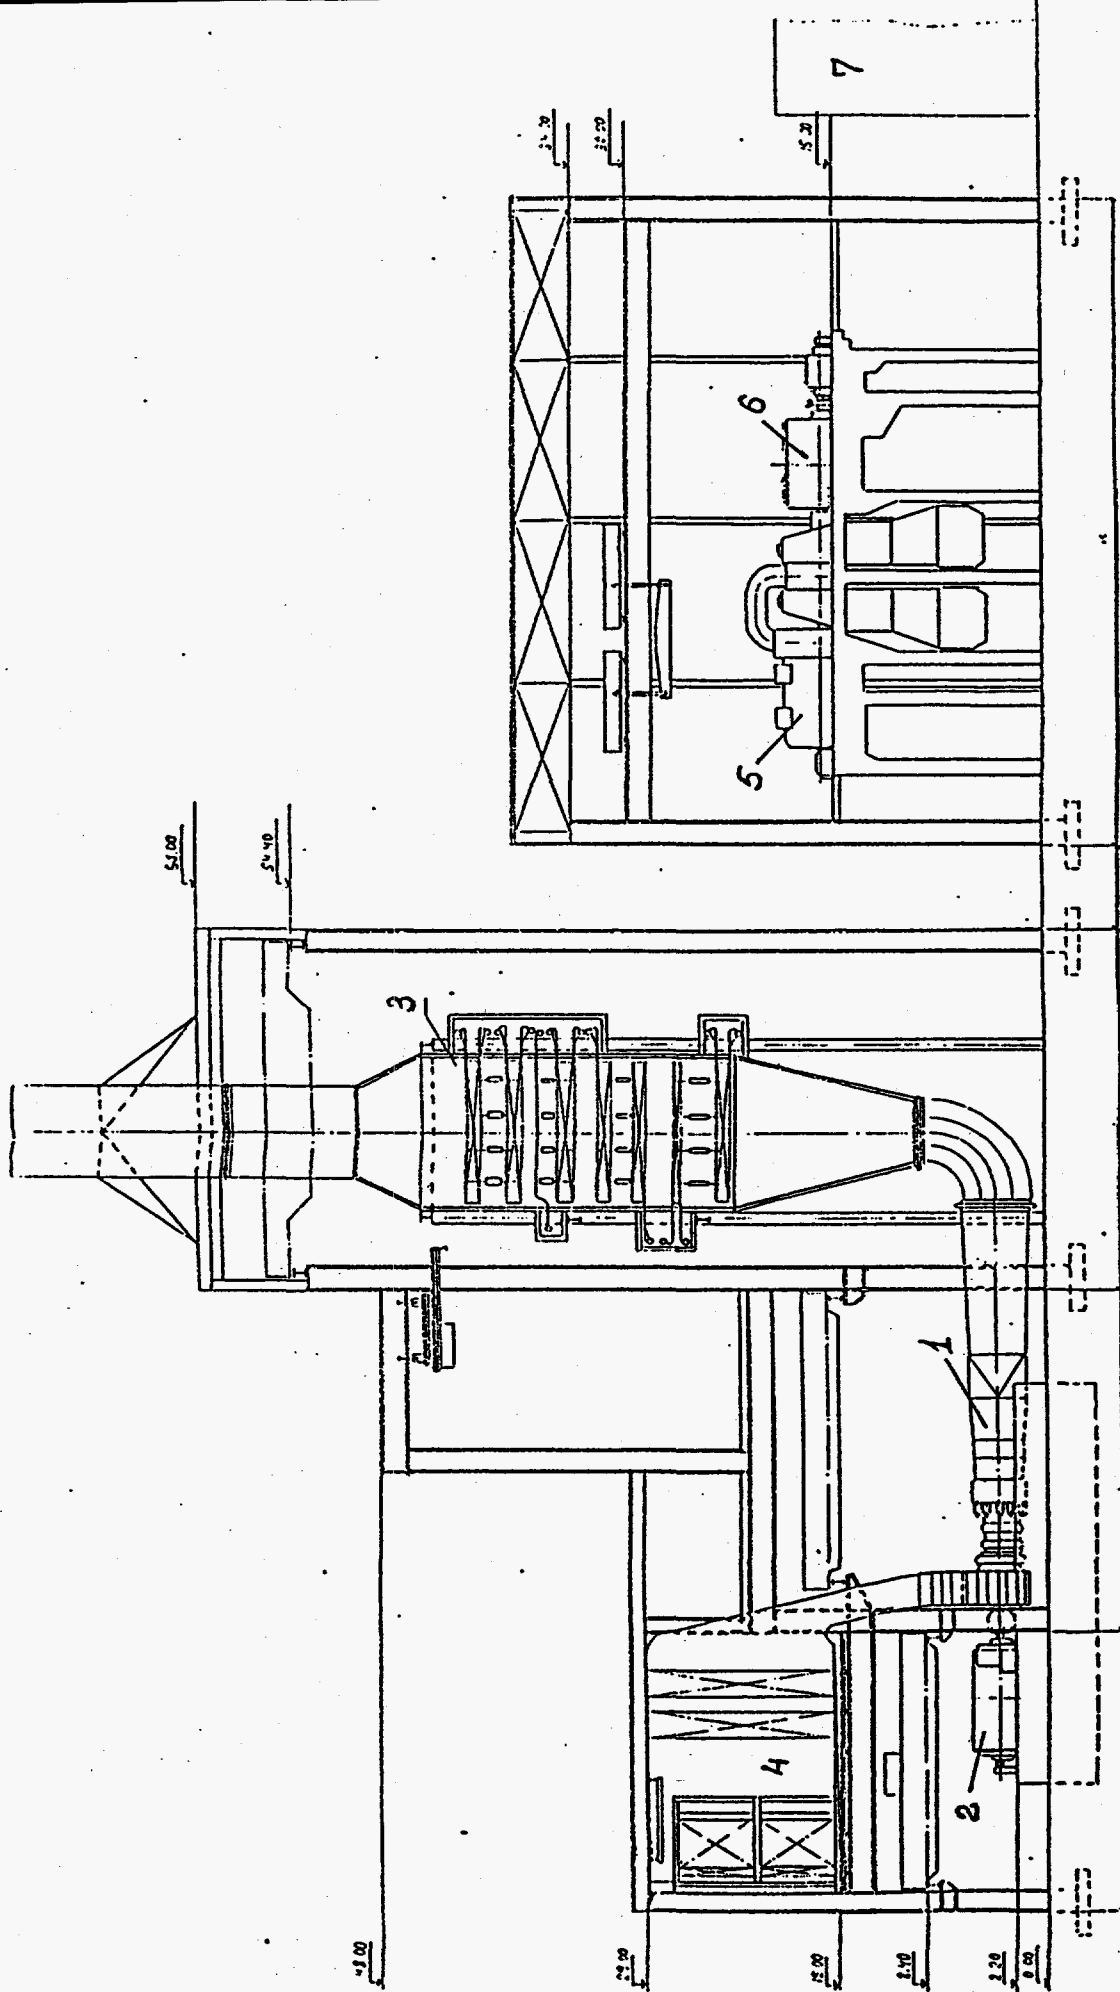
Cross-section of the Main Building for Power Part of IGCC Plant
